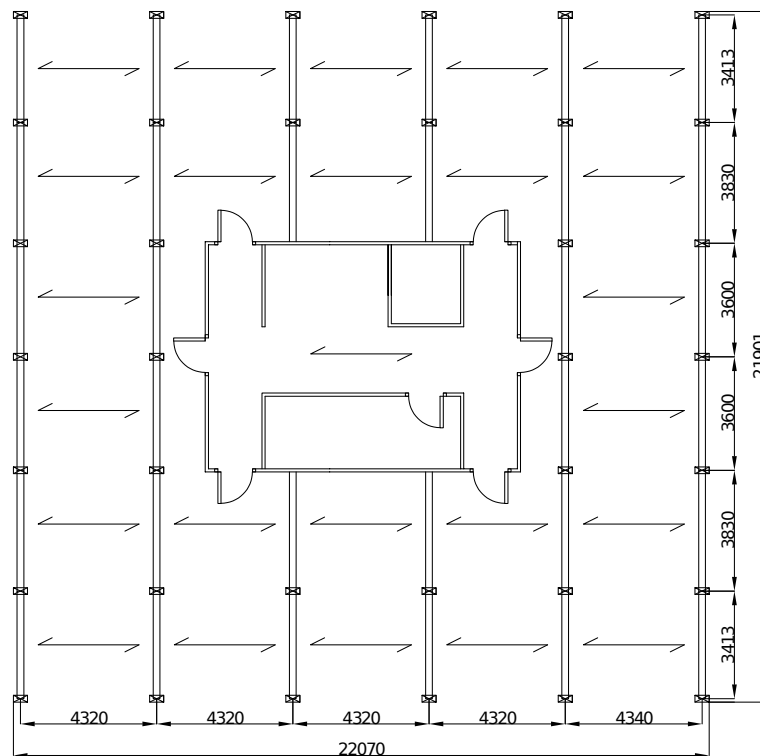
Layout of the floor plan of the office building with dimensions in [mm].
